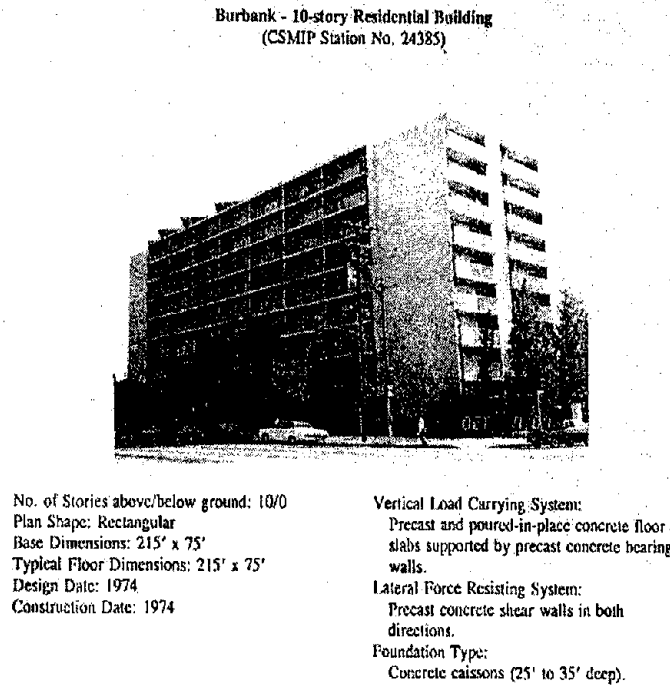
Details of 10-story residential building, CSMIP Station No. 24385
